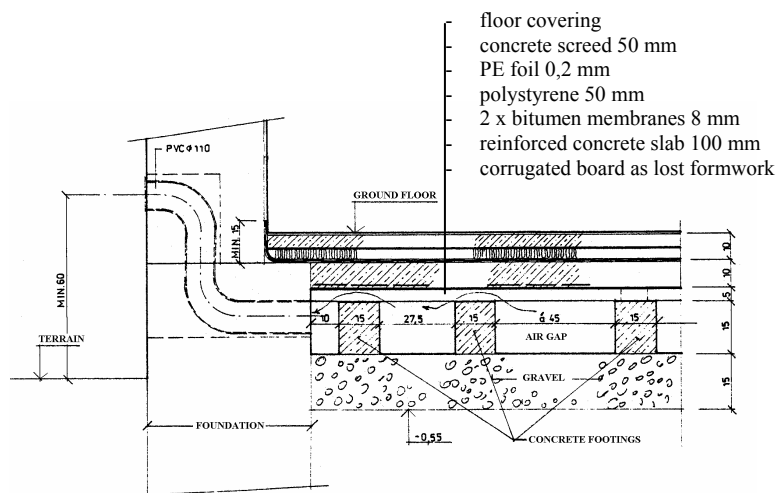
Structure of the ventilated floor installed into the house in 1994
